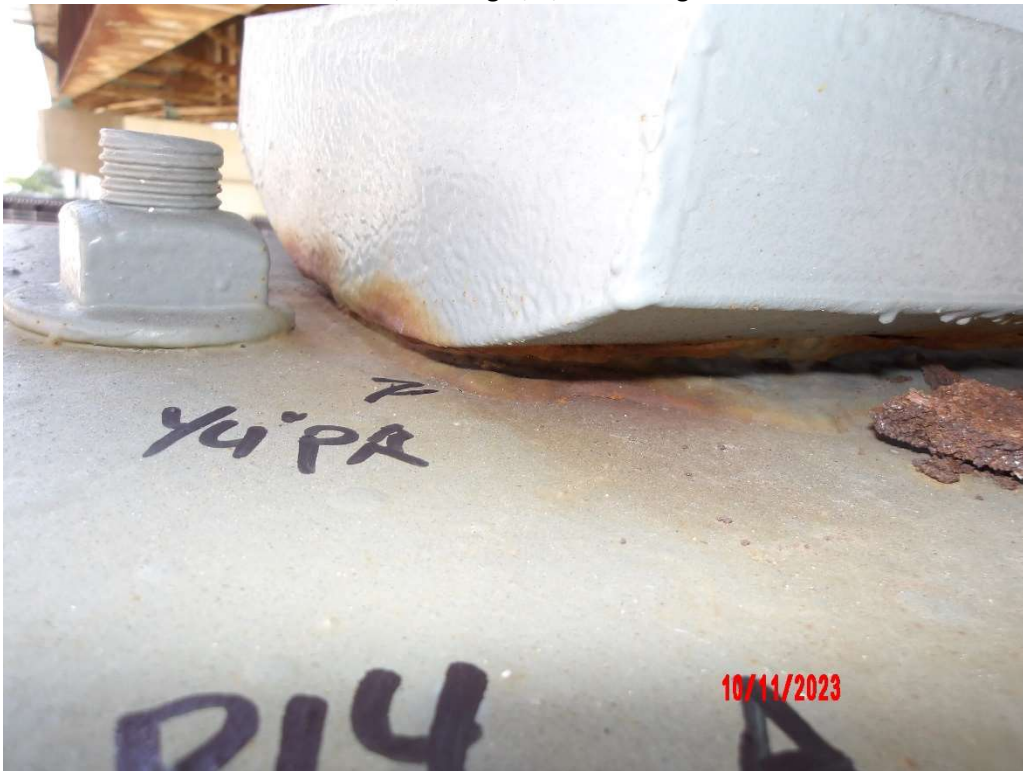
Pier 14, Bearing A, 1/4" Pack Rust
